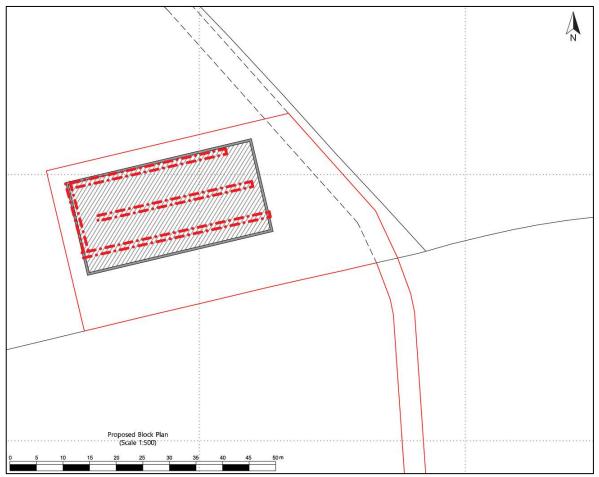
PLAN OF THE EXCAVATED TRENCHES (BASED ON ARCHITECTS PLANS).
